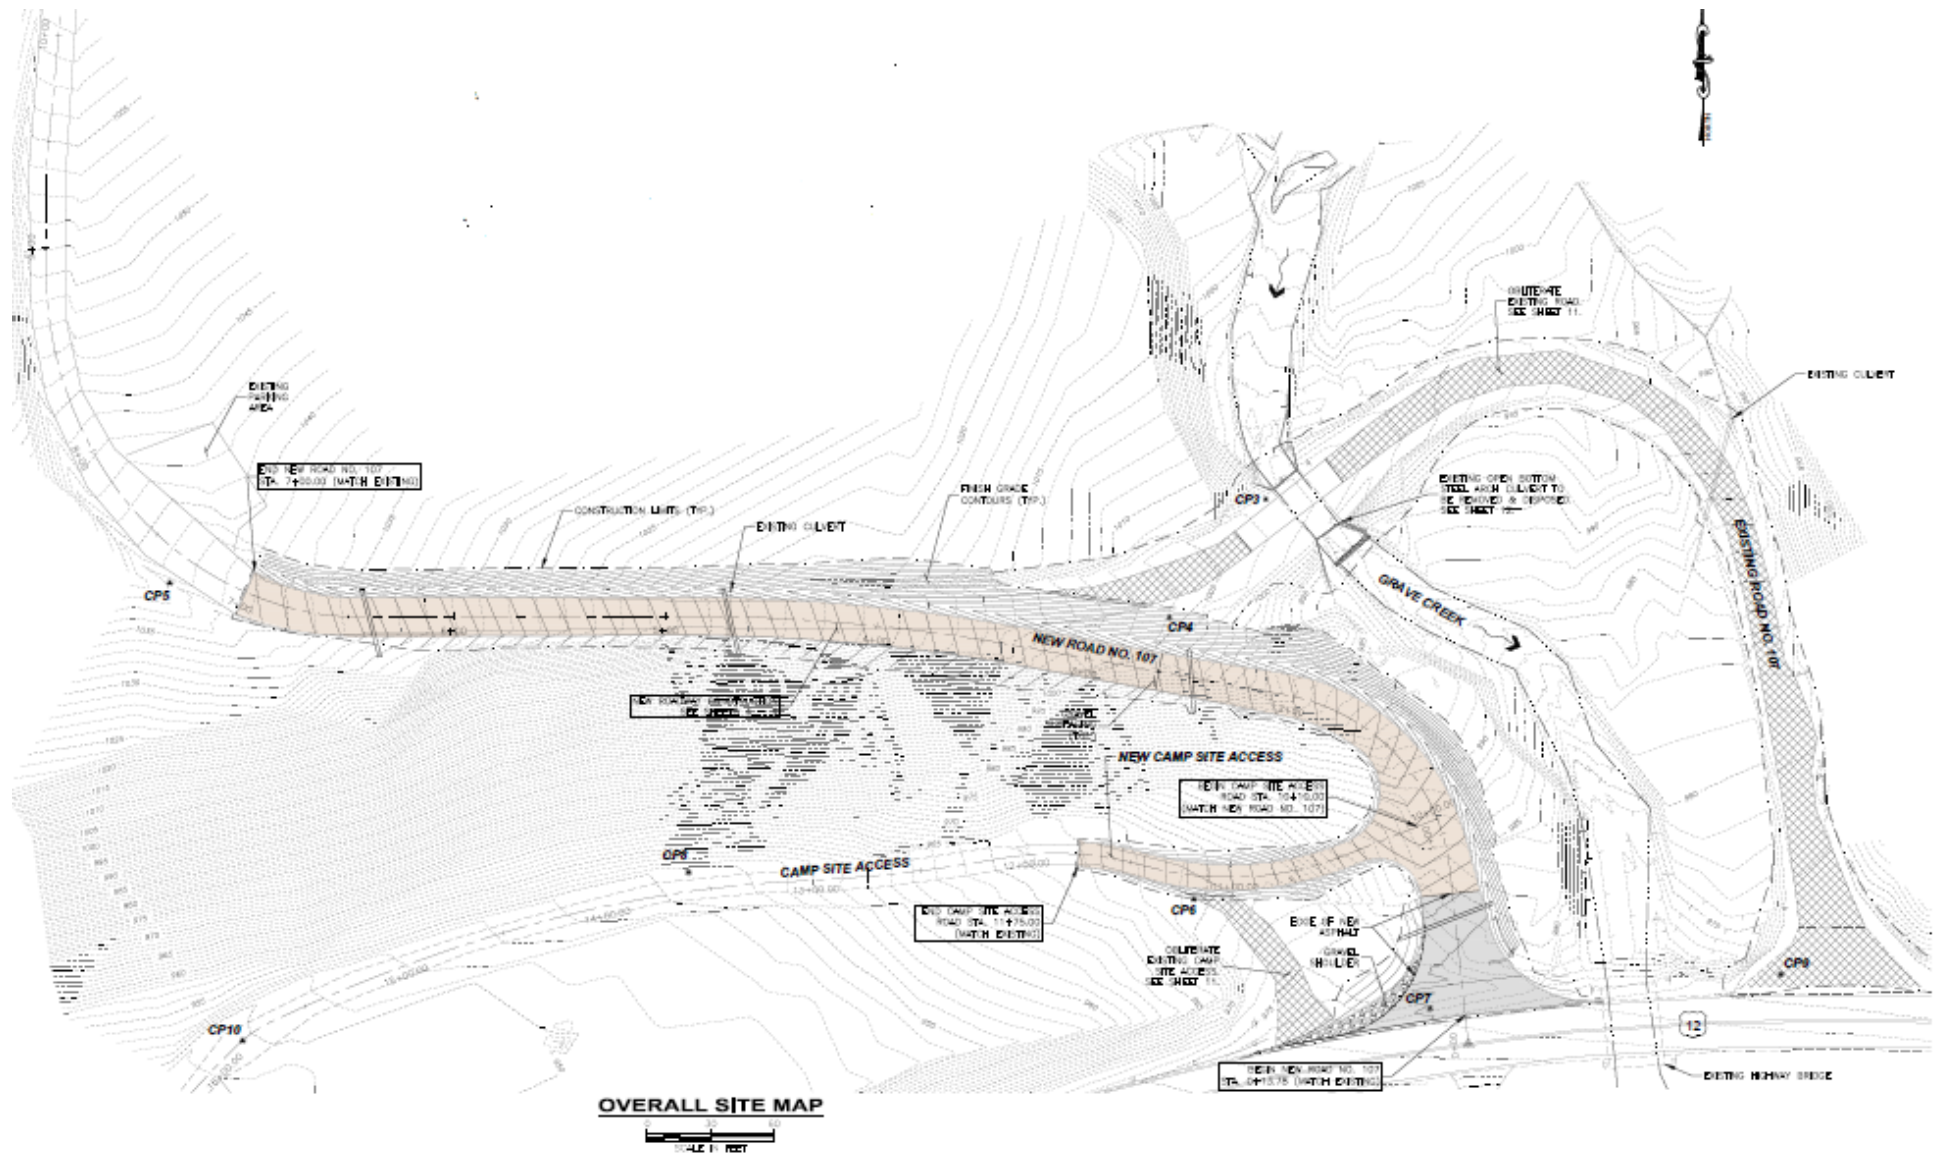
Engineering Plans for Road 107 Relocation and Decommissioning
